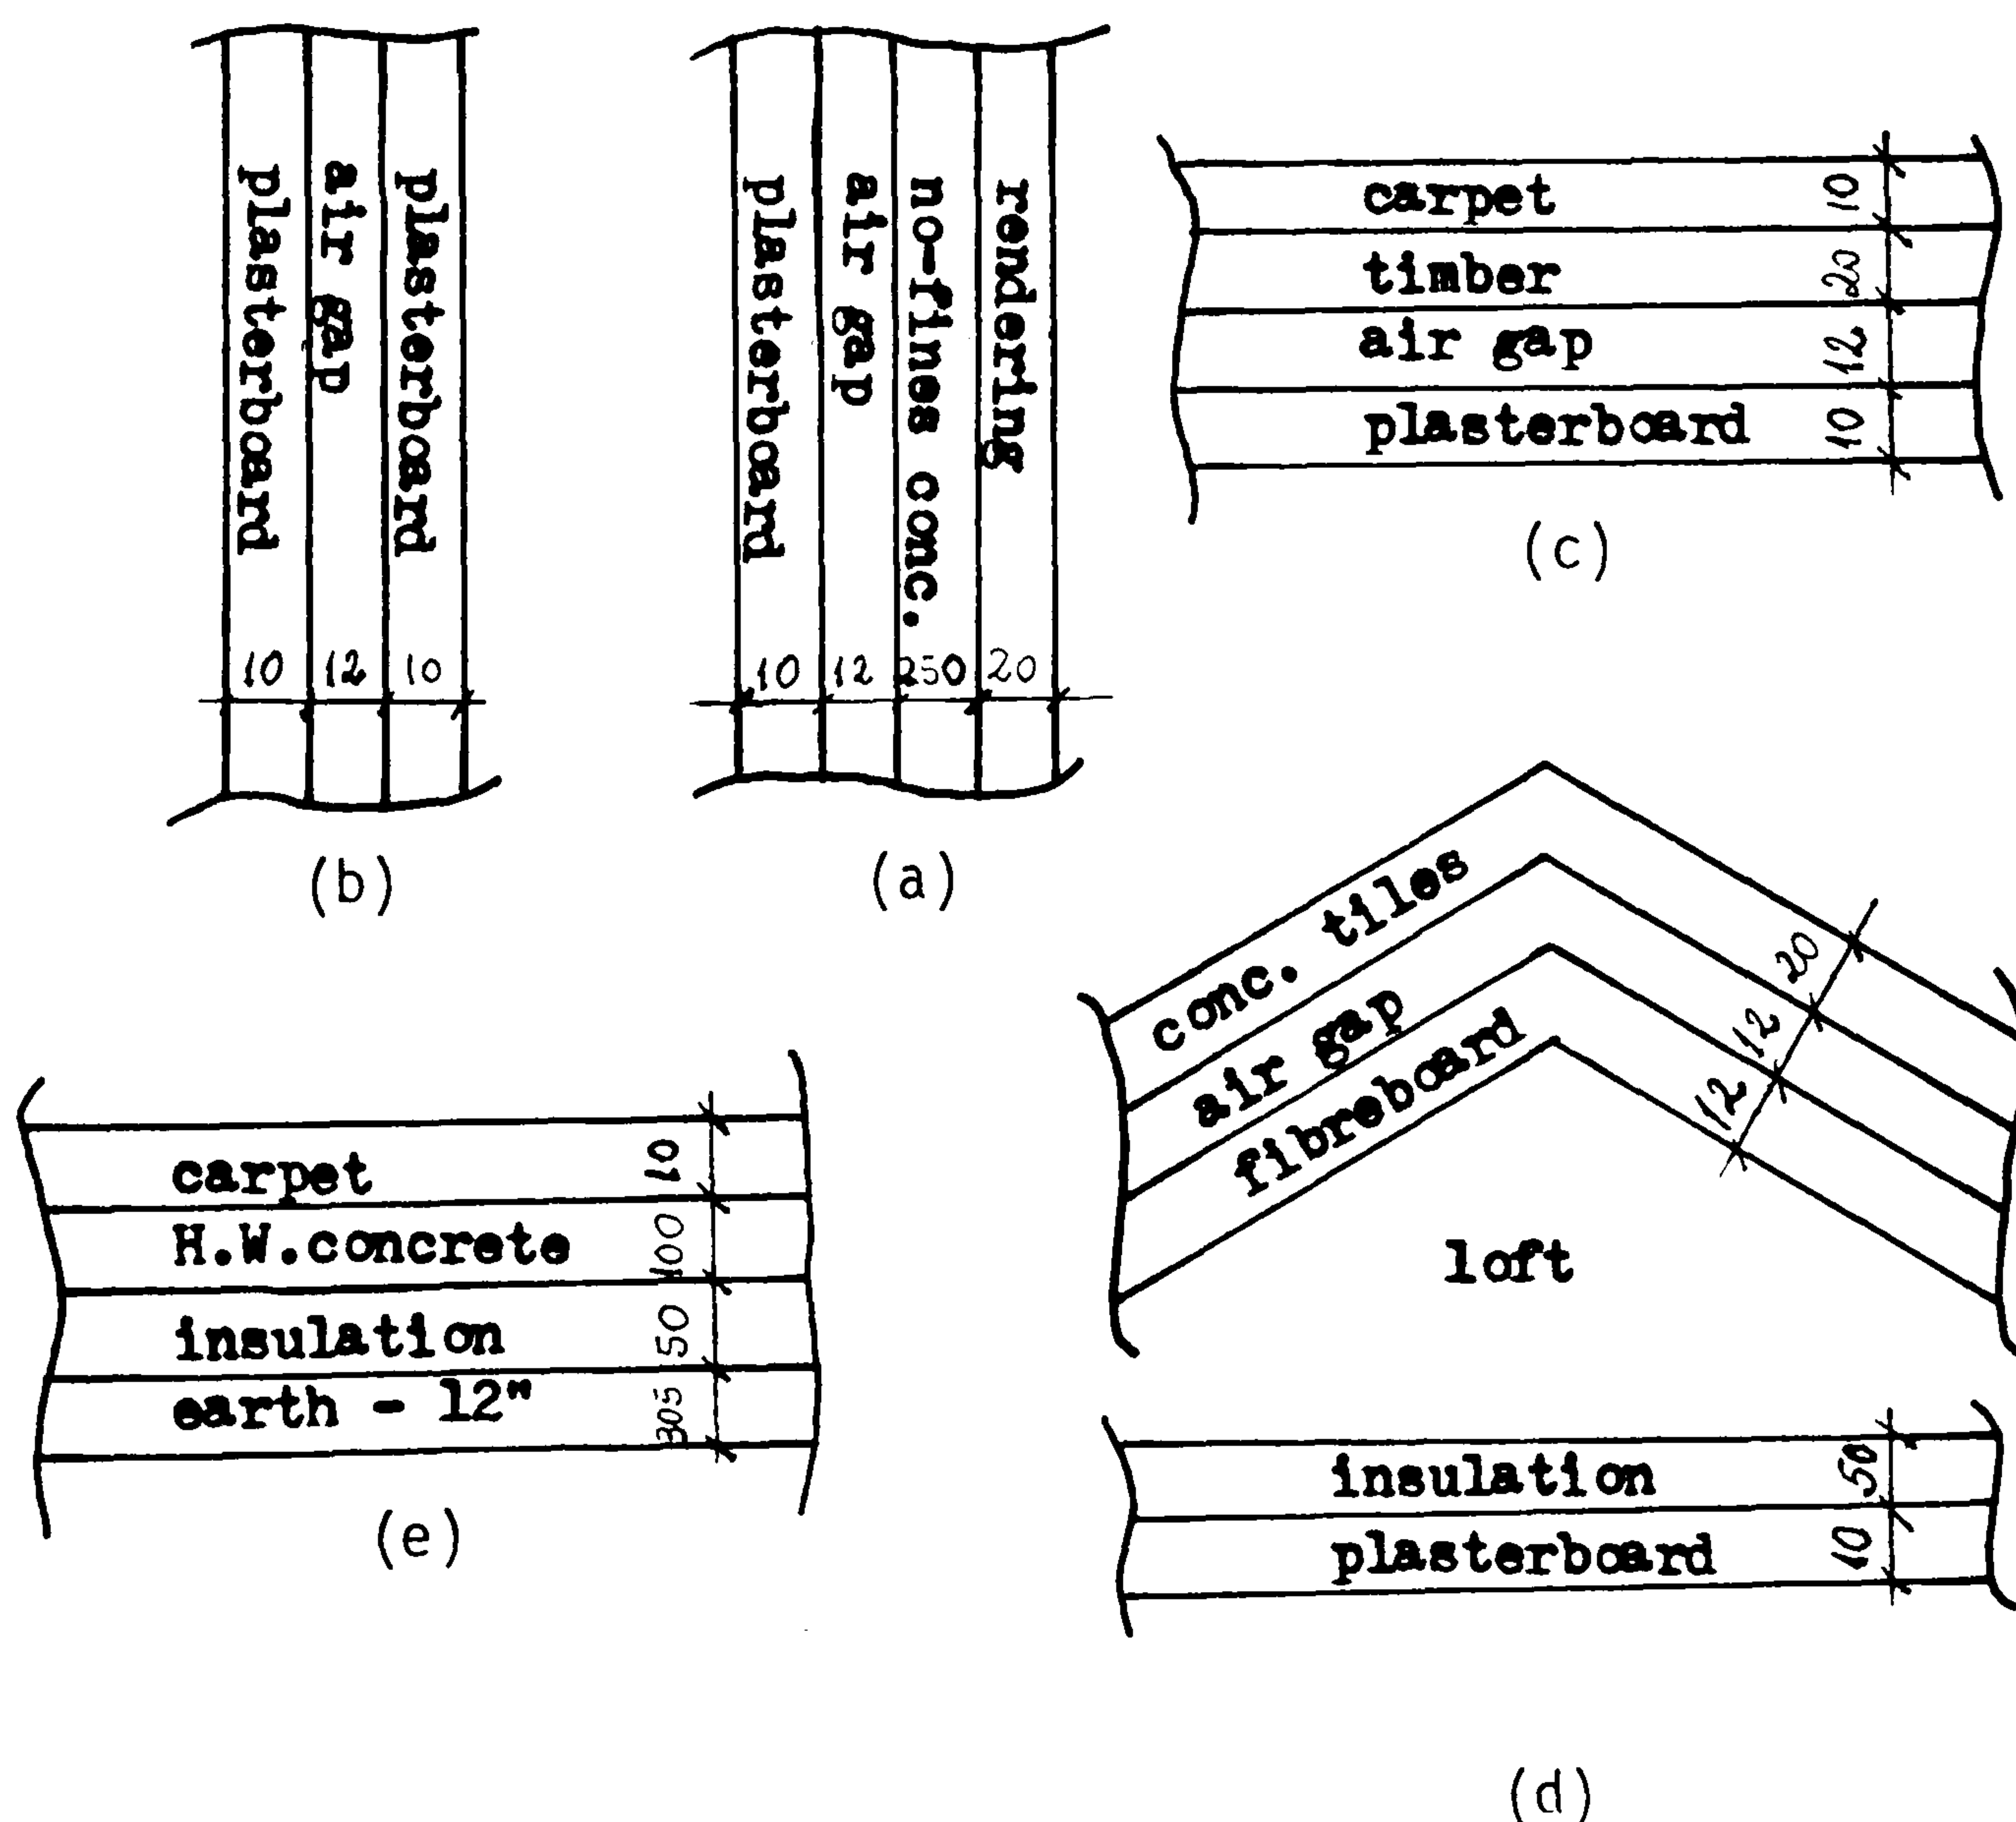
Multi-layered construction - Livingston 'test house':
